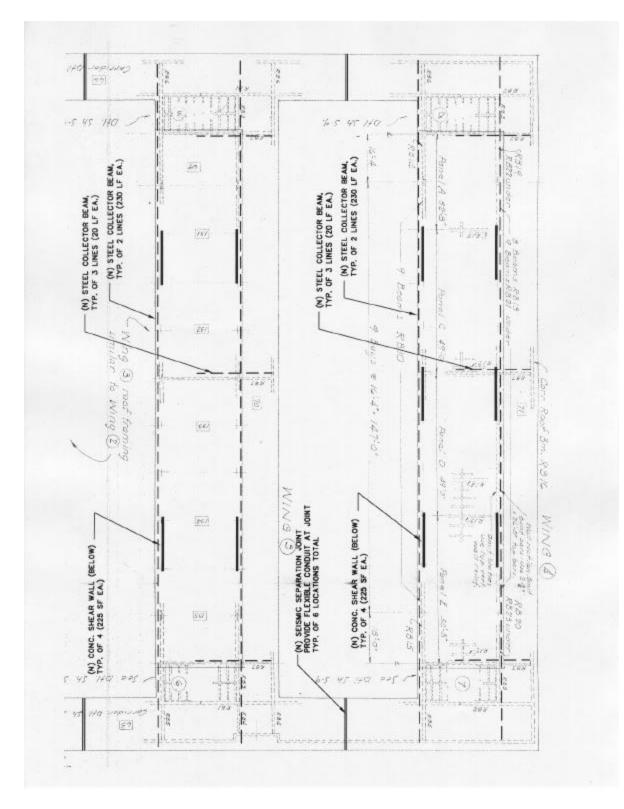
Main Building, Wing 1 & 2 Floor Framing Plan
